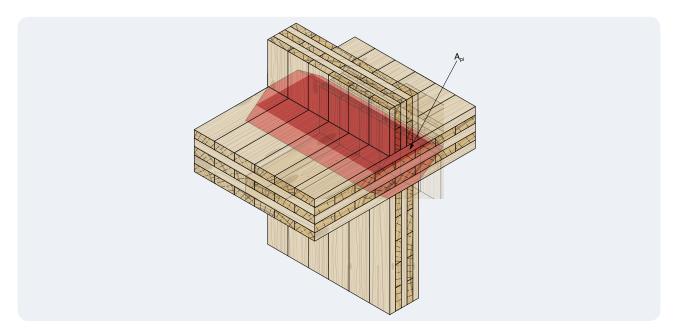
Bearing area of the floor for a CLT wall/floor transition.
